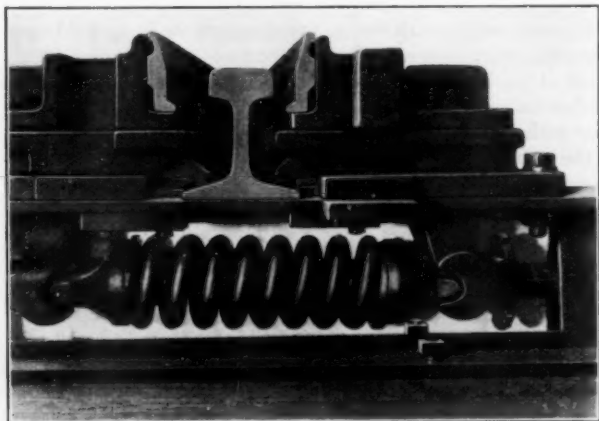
END VIEW OF RETARDER, SHOWING HEAVY SPRINGS
